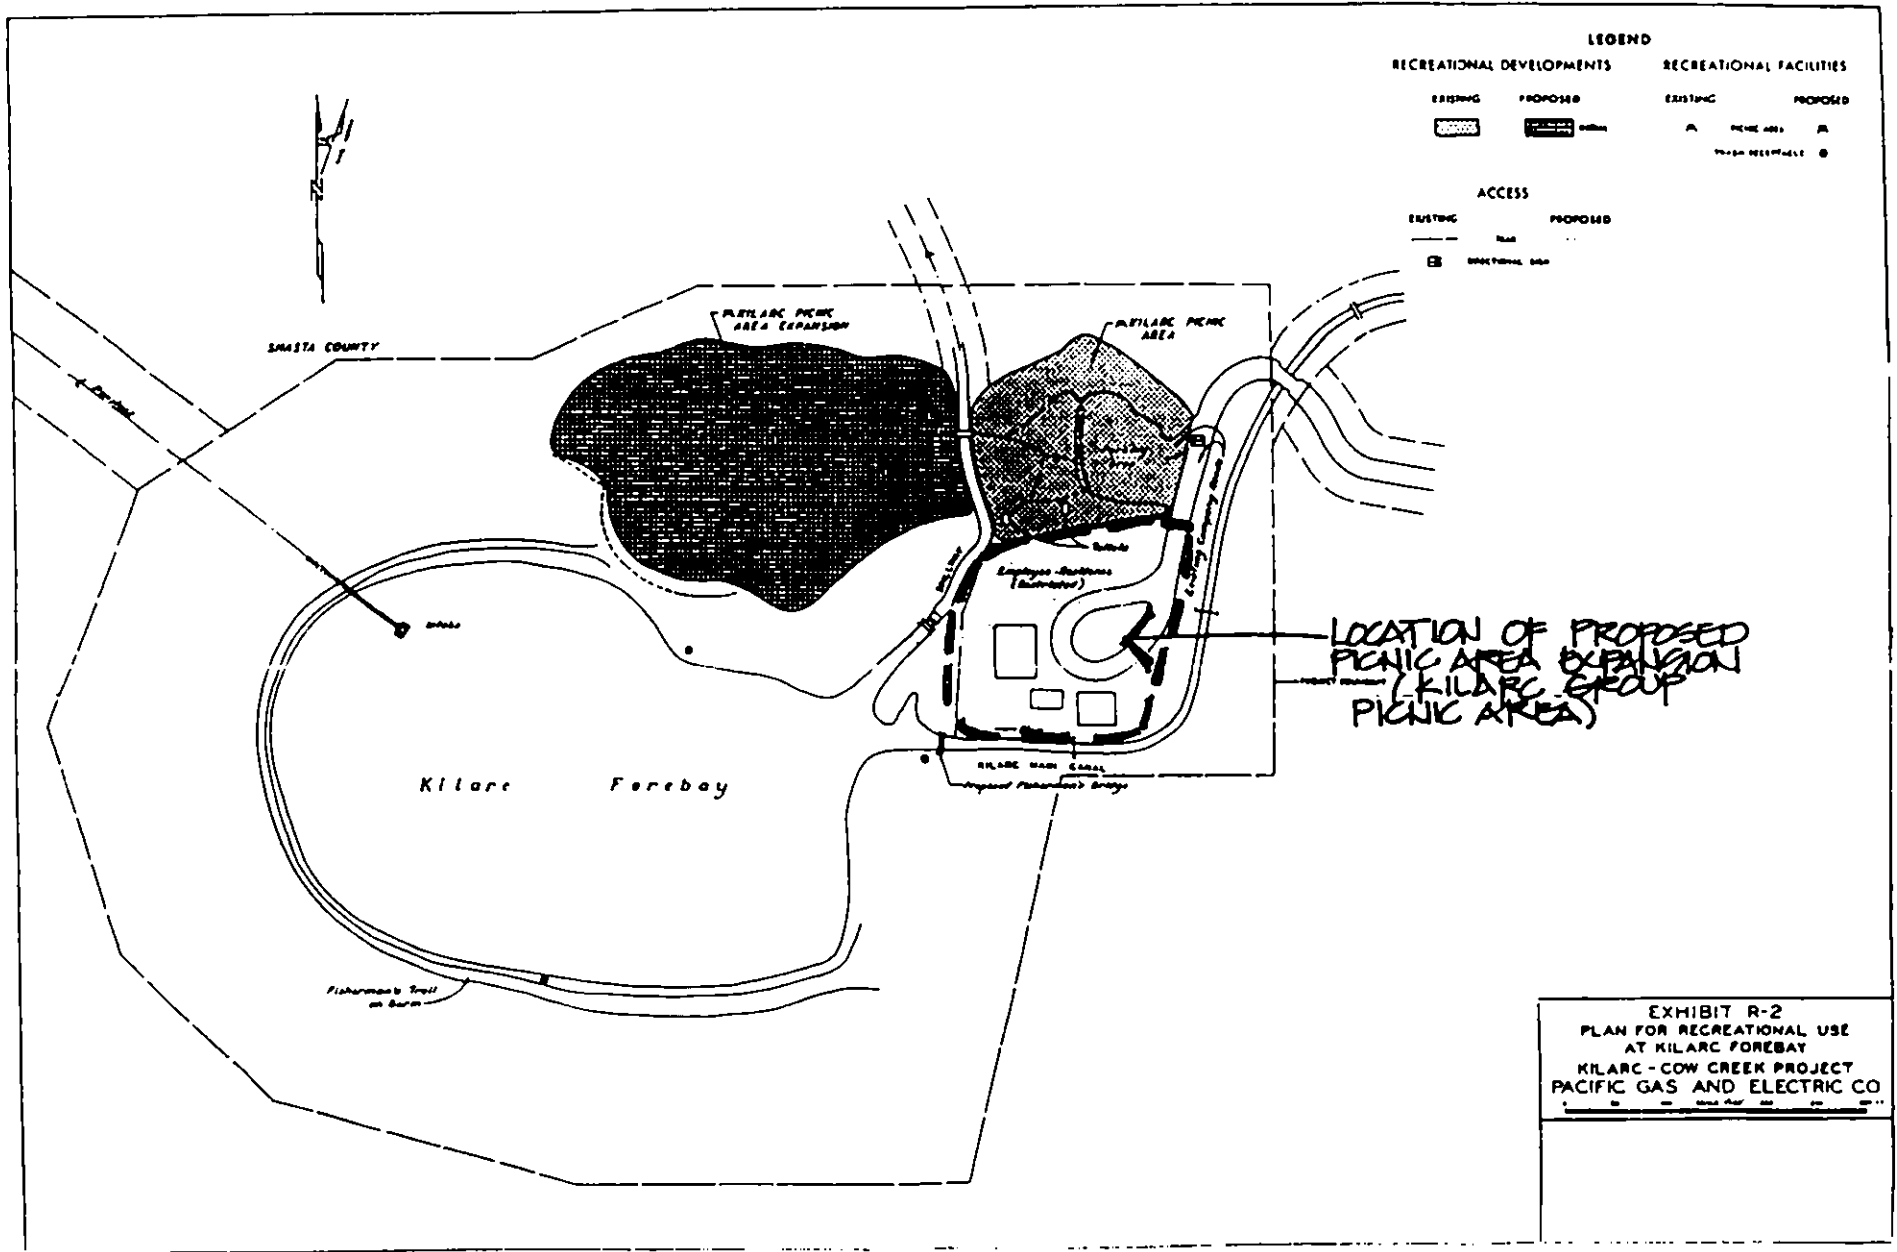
Exhibit R-2, Plan for Recreational Use at Kilarc Forebay.
